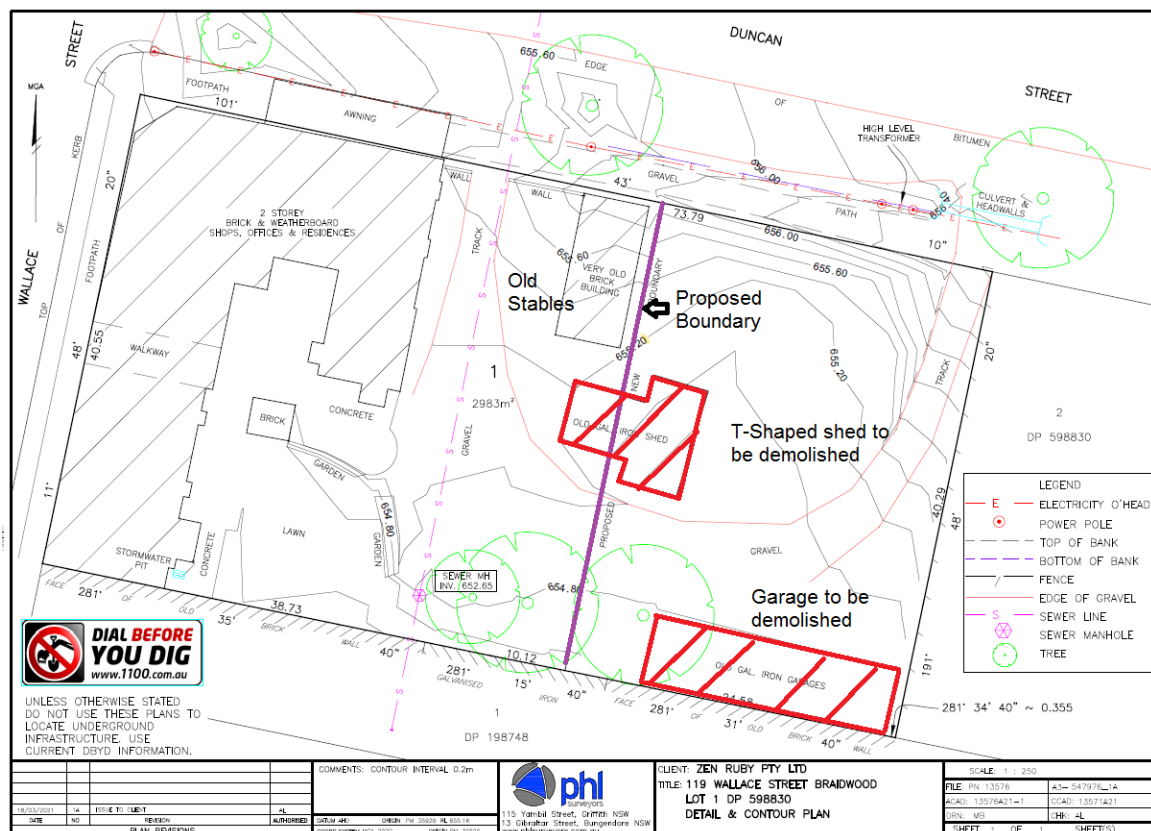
below shows the proposed subdivision boundary with the existing structures to be demolished shown in red.
